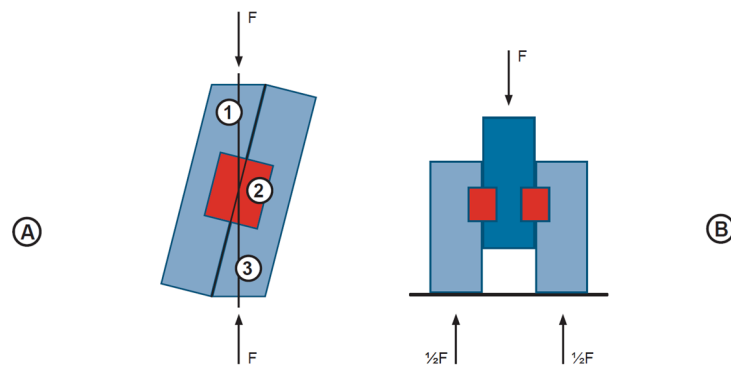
Principle of small-scale shear test setups: (A) slip-block-test acc. to DIN EN 408 and (B) push-slip-test acc. to EC4 (① and ②: test specimen as CLT-layer; ③: composite system, f. hardwood dowel).
